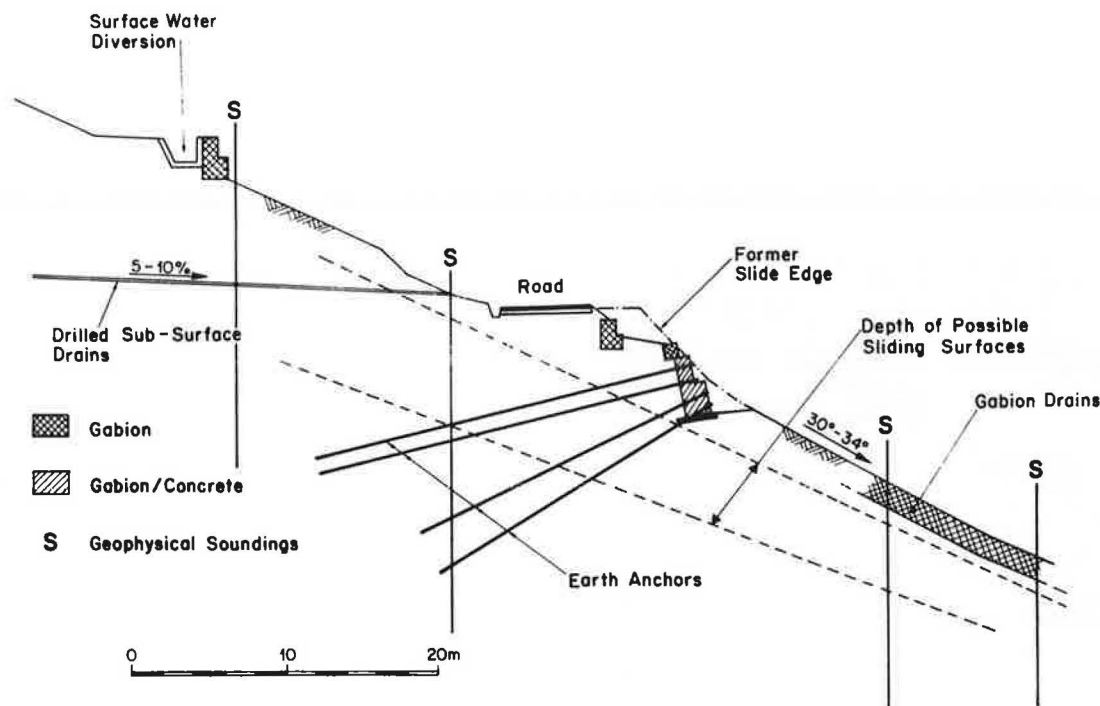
Cross section of slide stabilization measures at Km 45.4.
